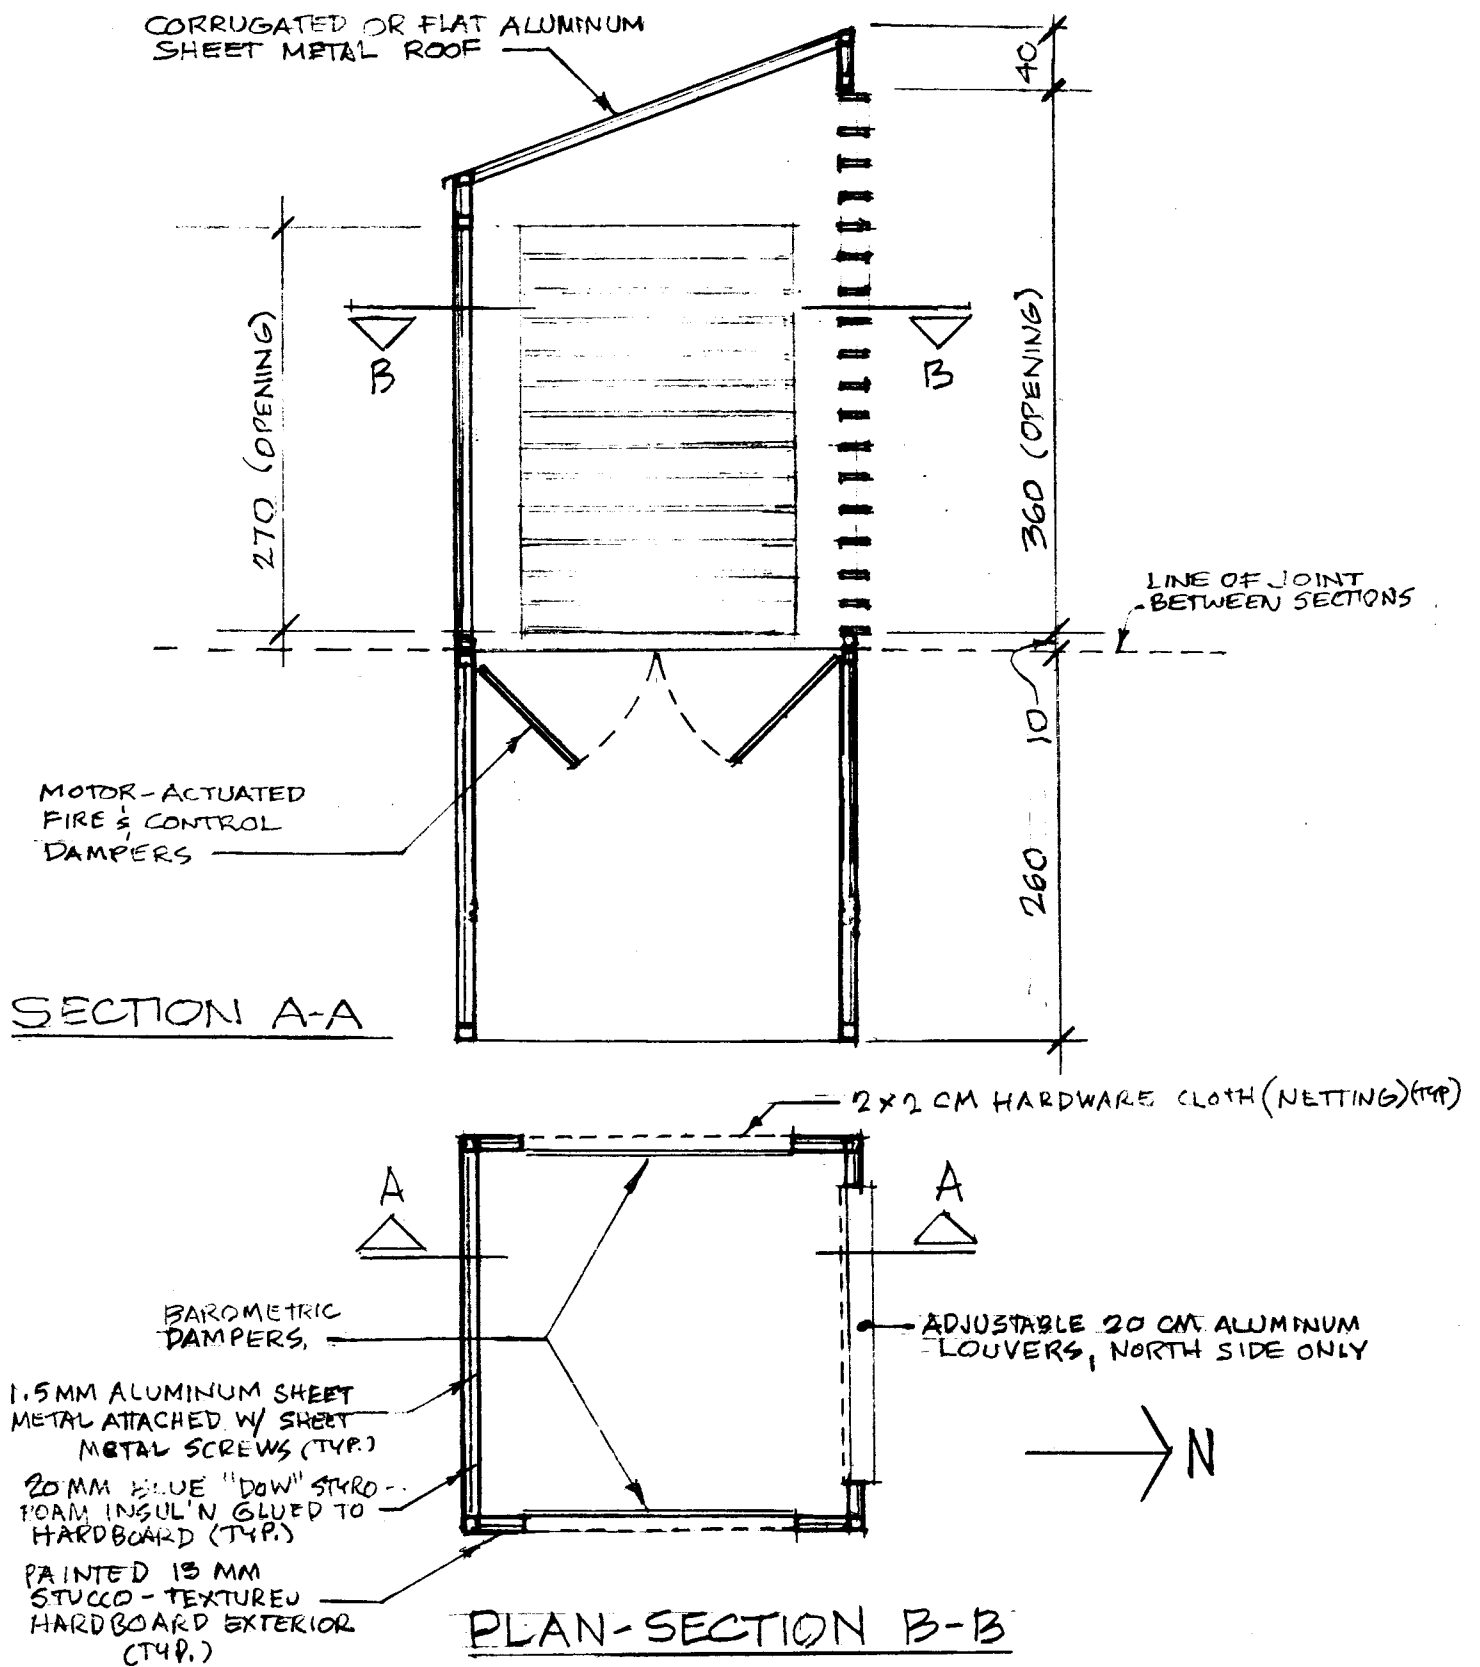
WIND TOWER (STEEL-FRAMED SECTION) ALT. # 1
